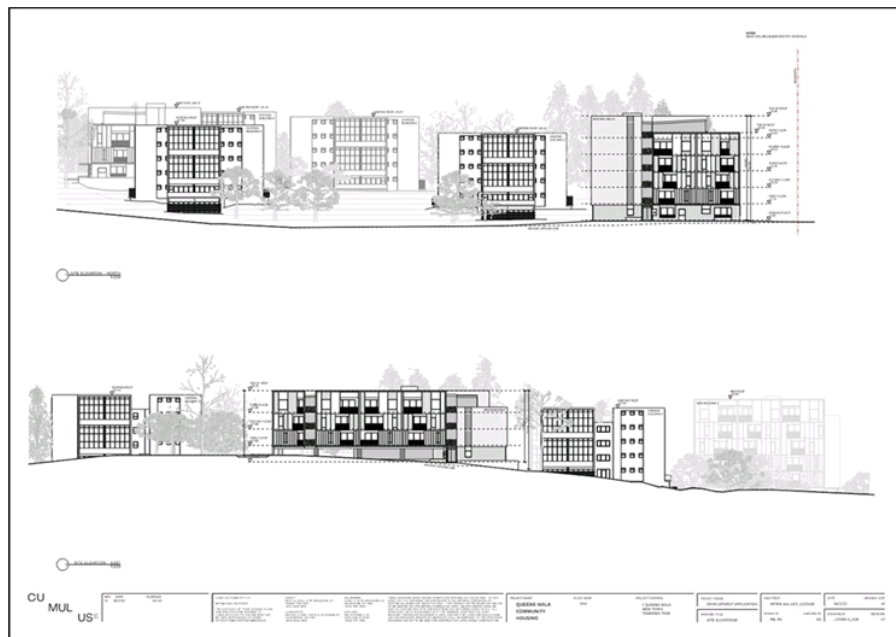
Site elevations depicting the proposed buildings within the site – Building E is to the right of the top (north) elevation, with Building F in the background on the left. Building F is central on the bottom (east) elevation, with Building E greyed out on the right. (Source: Cumulus).
